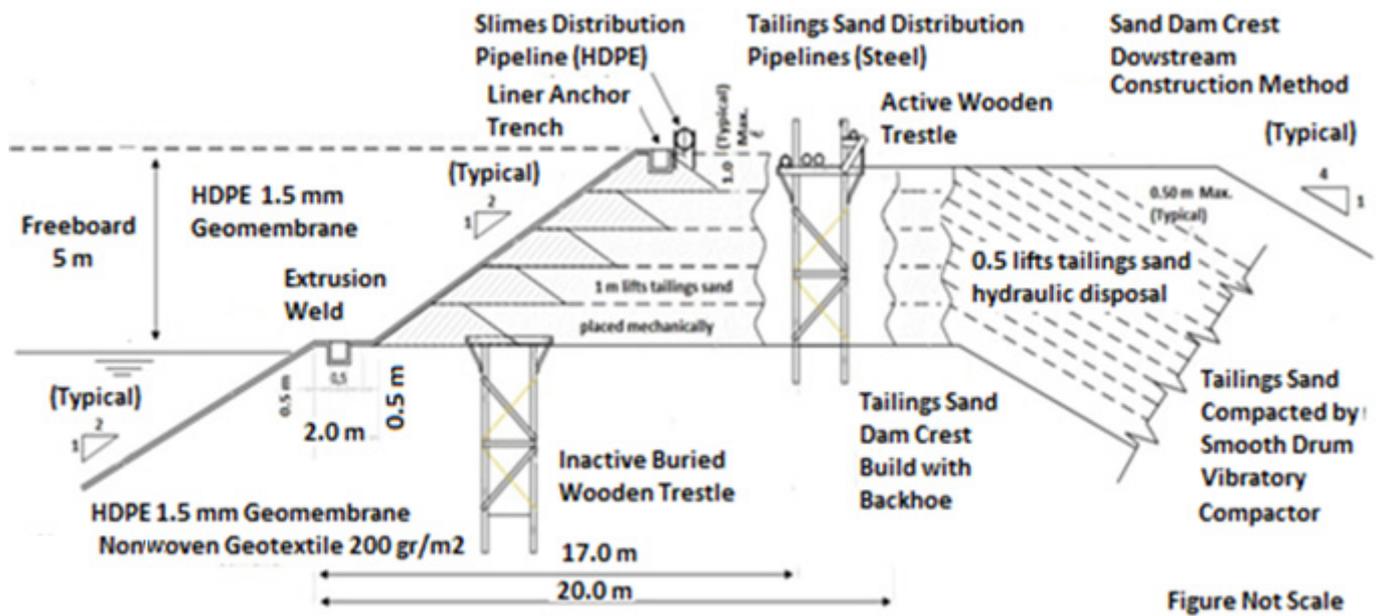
Cycloned tailings sand dam upstream face waterproofing construction detail.
